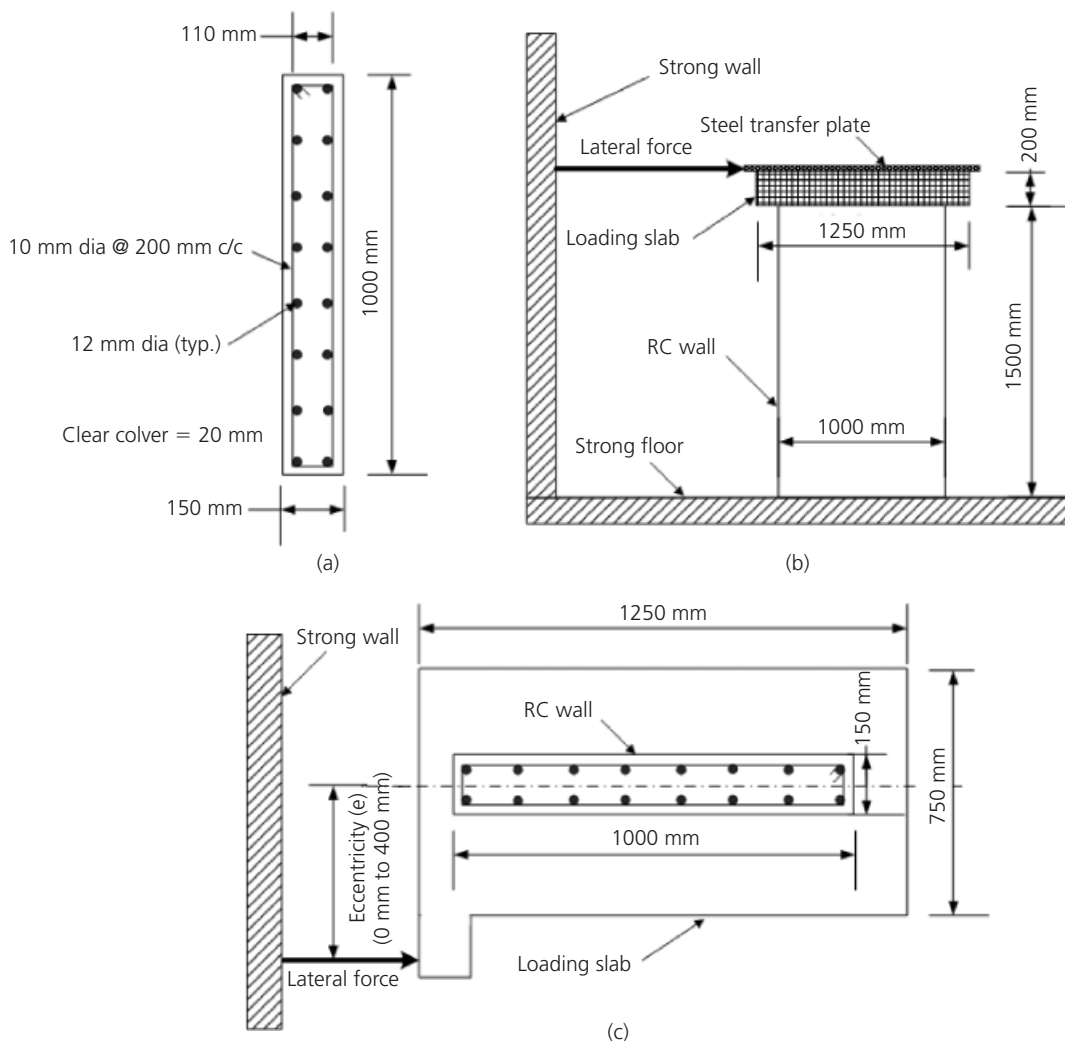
Wall details: (a) cross section, (b) elevation, (c) top view and loading set-up (Peng and Wong, 2011)
